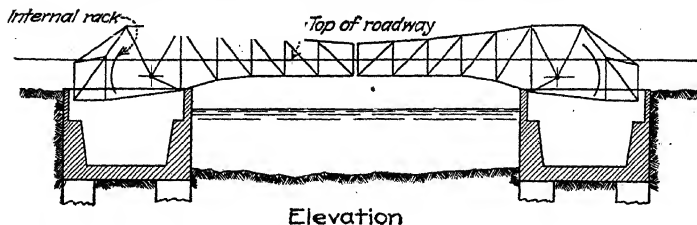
General design of Jefferson Avenue and Fort St. Bridge, Detroit; also the railroad bridge for the Detroit, Toledo & Ironton R. R. over the Short Cut Canal at Detroit.
